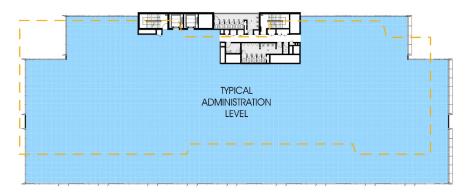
Proposed Building B floorplate with SSDA approved outline in orange
